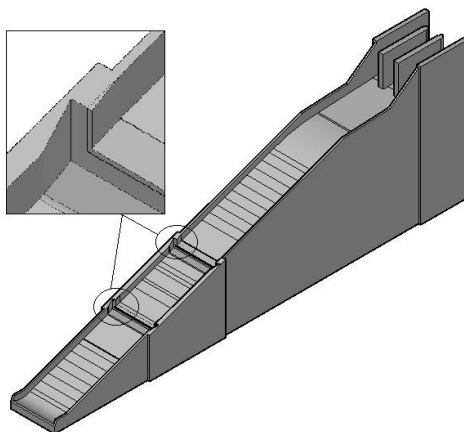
Model of spillway with aerator ramps on the floor and walls.
